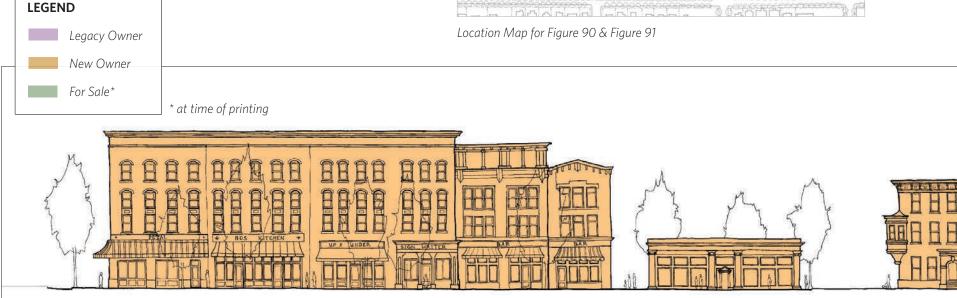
Building Divisions by Property Ownership along W. Michigan Avenue, Facing South
